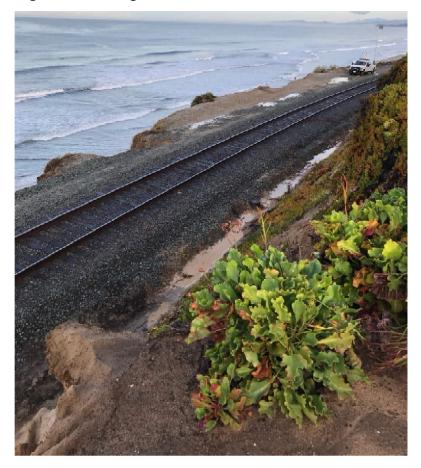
Existing Trackside Channel north of 13<sup>th</sup> Street
